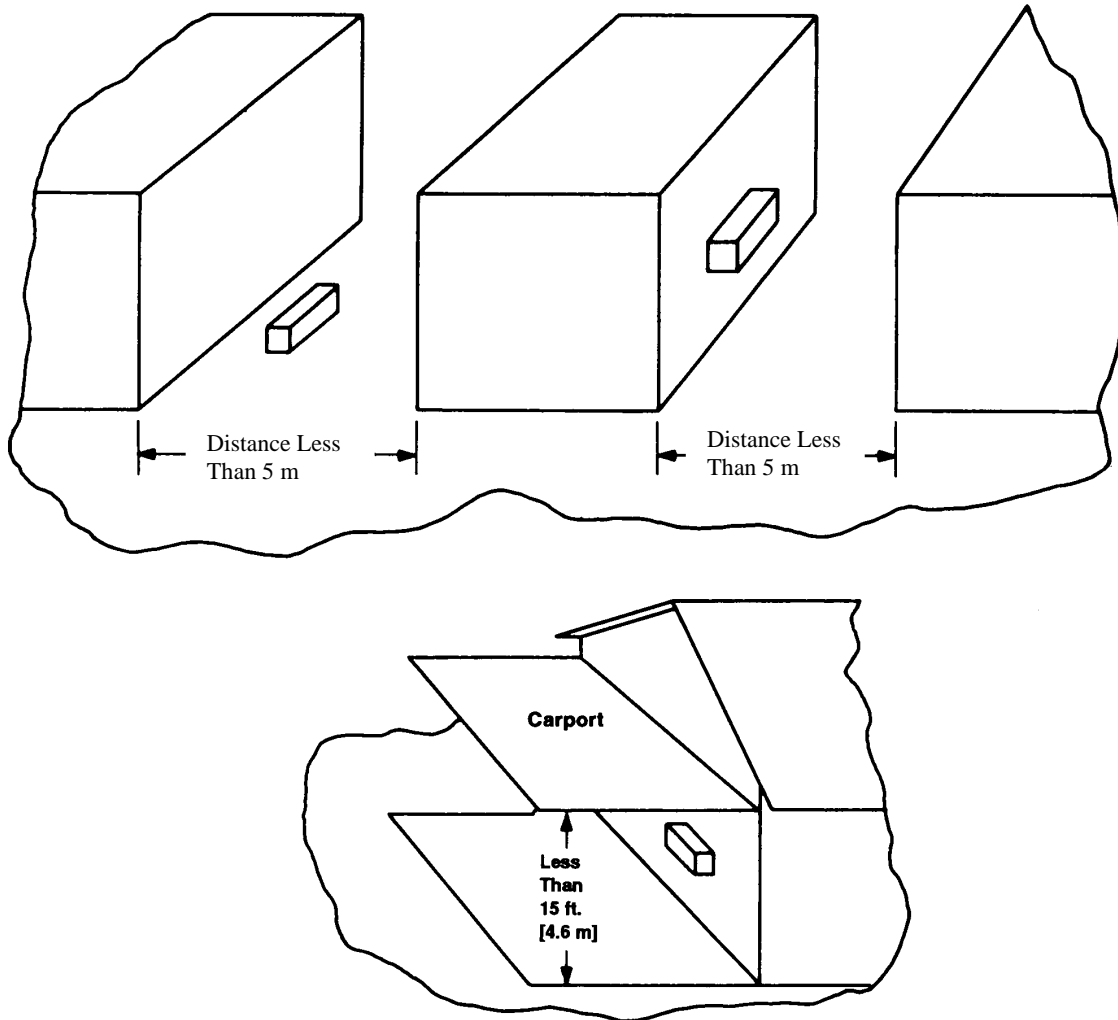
On Ground, Roof, or on Side of Building Wall – Between Two Opposite Reflecting Surfaces
